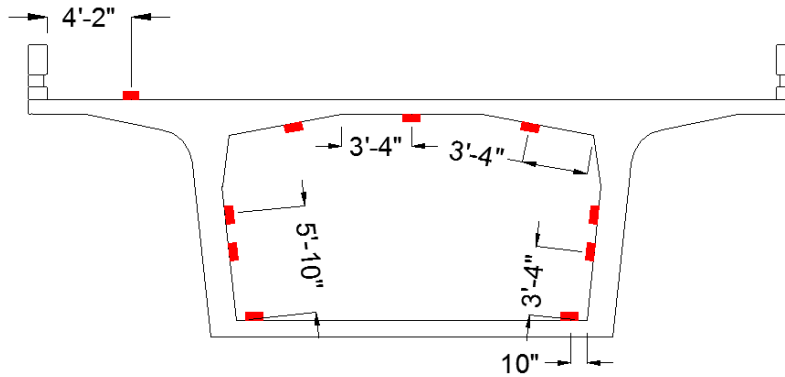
Smart Road Bridge Section A Transverse Strain Instrumentation – Looking in the Direction of Southbound Traffic
